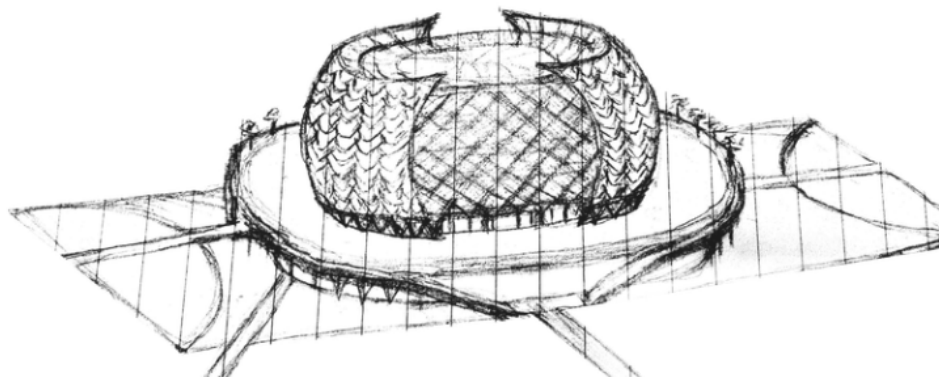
Pangolin-Inspired Façade Concept (Source: Author)
